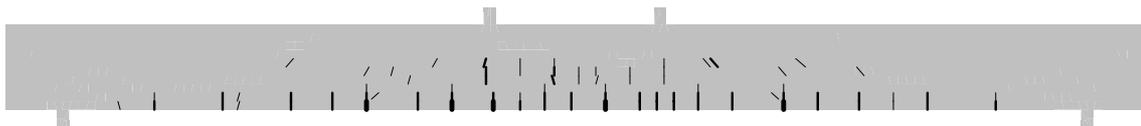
Calculated crack pattern at a load level of 60 kN (the maximum crack width is 0.32 mm, and only cracks larger than 0.07 mm are shown)
